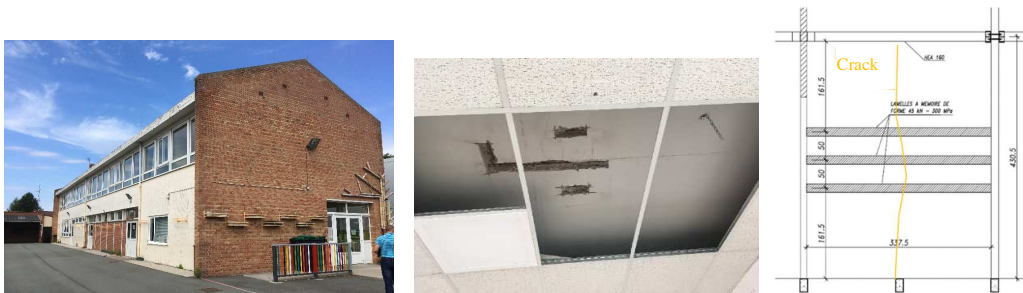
General view of jobsite, slab area with cracks and reinforcement disposition
